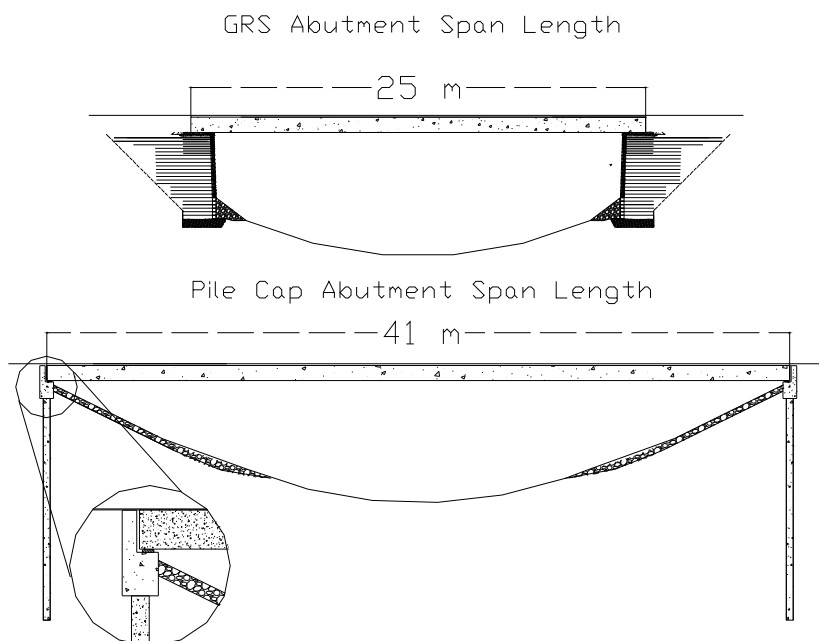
Illustration of Bridge Span Length for GRS and Pile Cap Abutments
